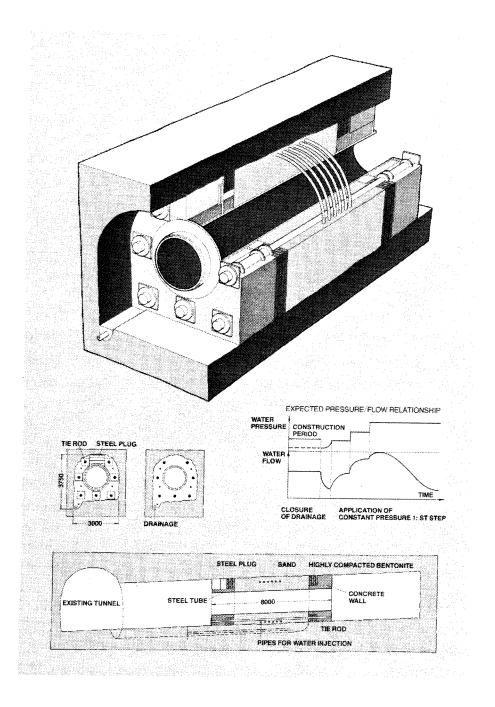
Schematic layout of a test. Highly compacted bentonite is tested for sealing a waterbearing fracture zone crossing a drift.
